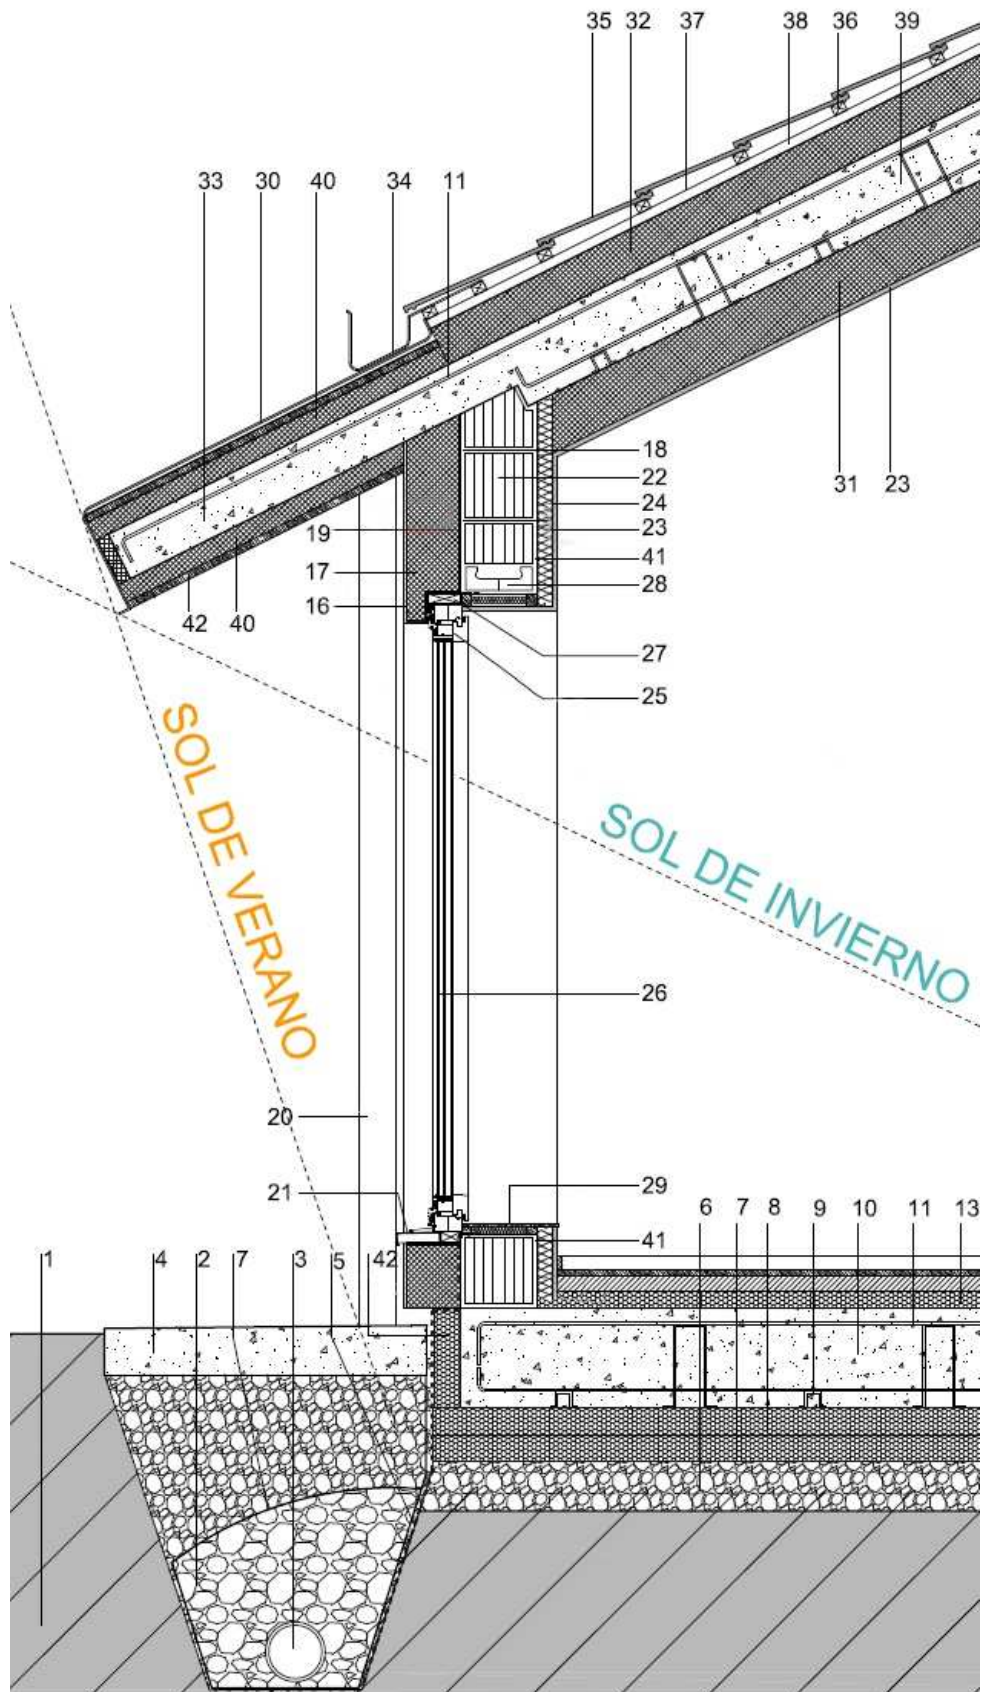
Construction detail of roof façade, window, roof overhang and sidewalk. (plans provided by CliM arquitectura S.L.)
